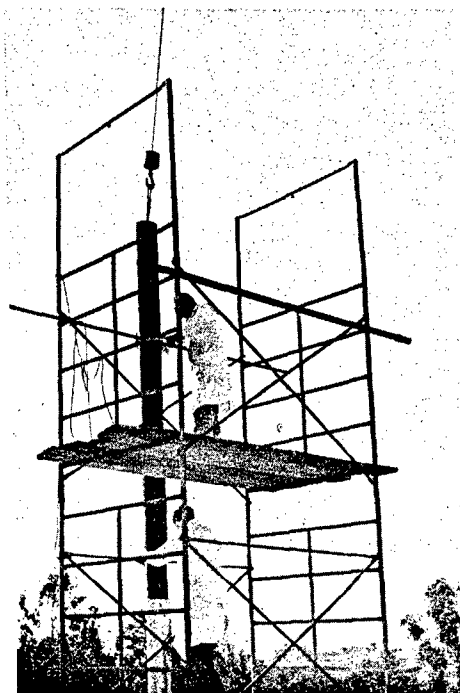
Kiln Construction Stages (Extending Hinge Post)
